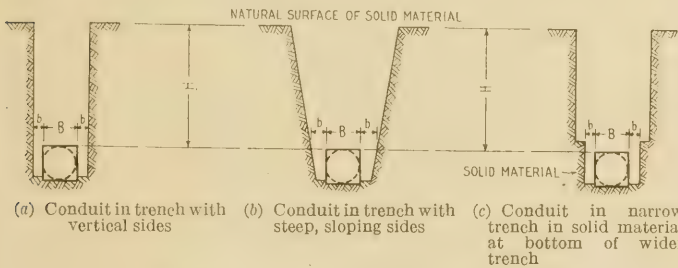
TYPICAL EXAMPLES OF DITCH CONDITION OF LOADS ON CONDUITS FROM TRENCH FILLS OR EMBANKMENT MATERIALS
